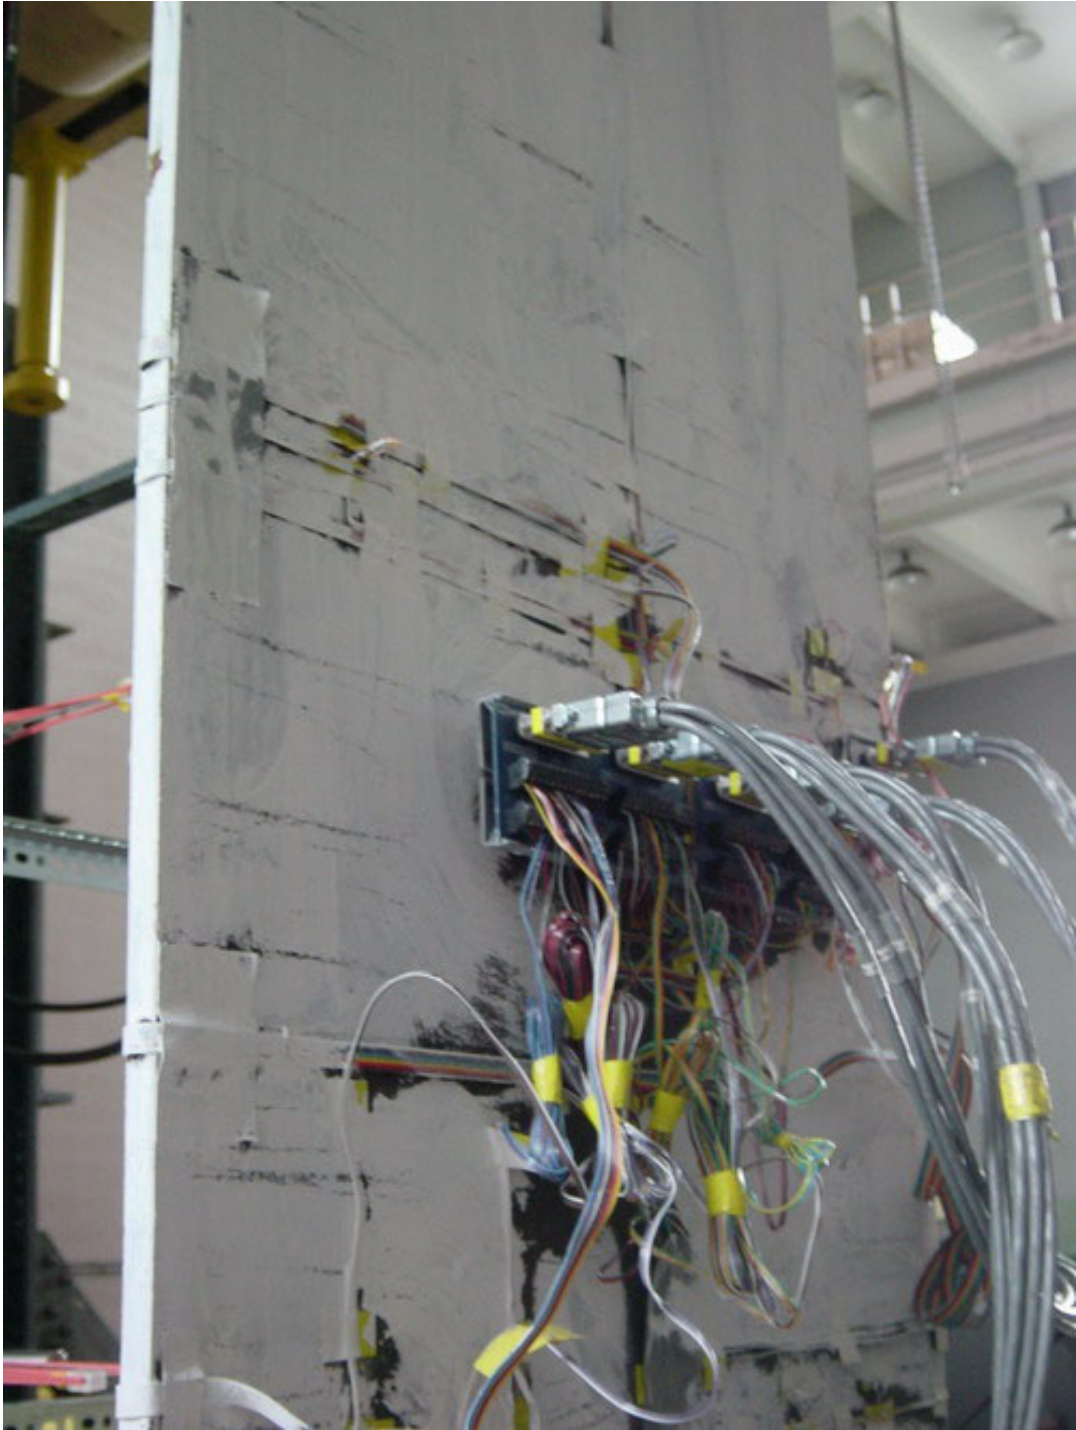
Final Appearance of Single Rib Beam-column Specimen SBC1
